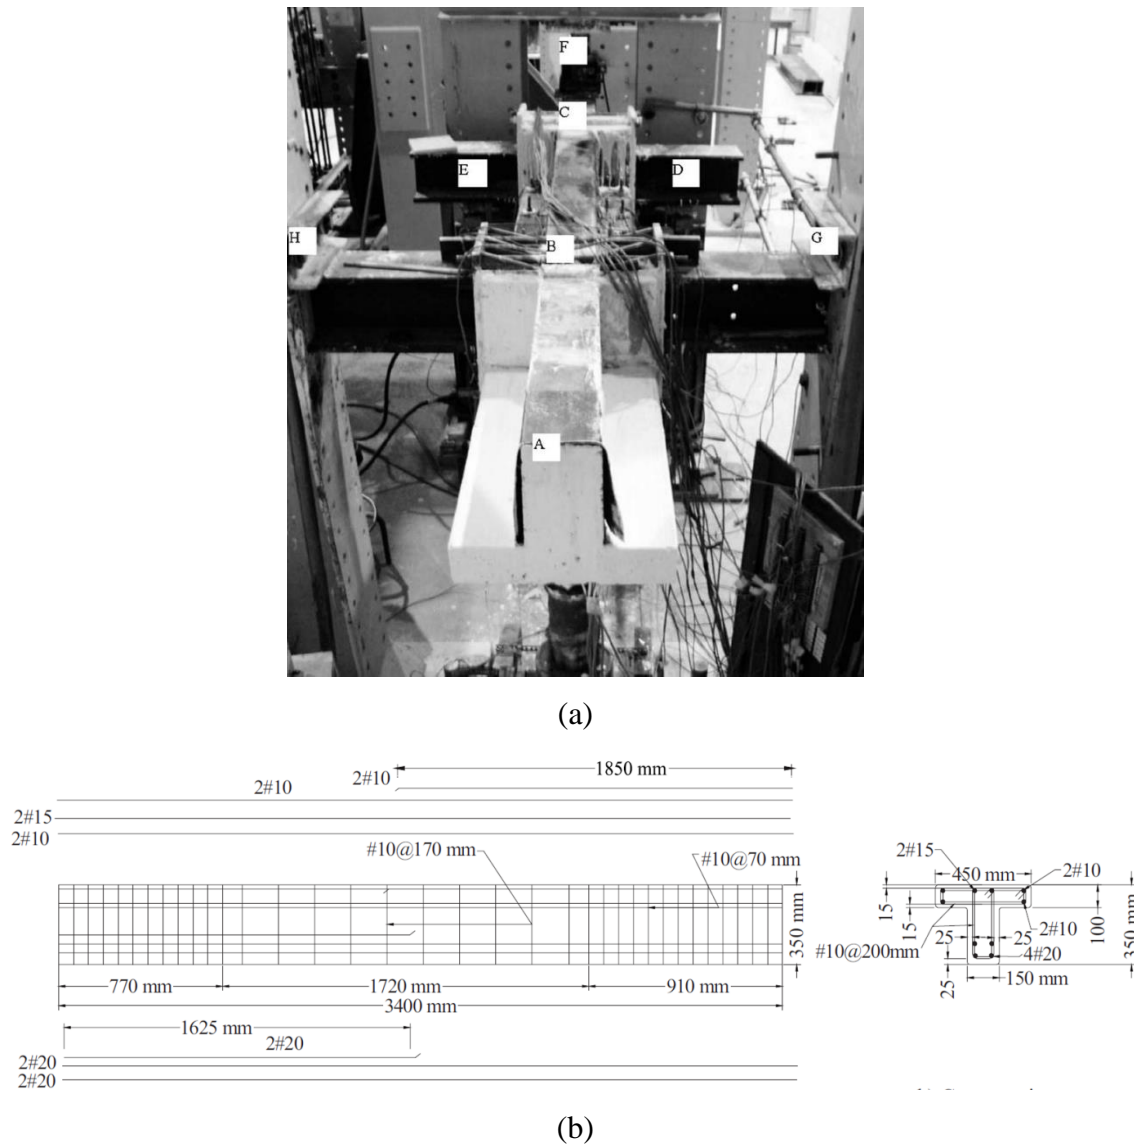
(a) Experimental set up (b) Longitudinal and cross section reinforcement details, A Deifalla & Ghobarah (2010)
